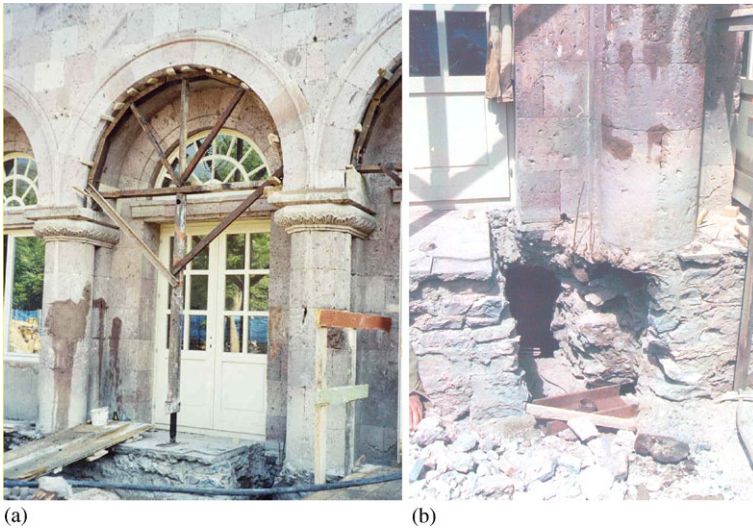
Temporary support under the existing arches (a) and the part of the foundation under the one quarter of the column section is taken out (b)
